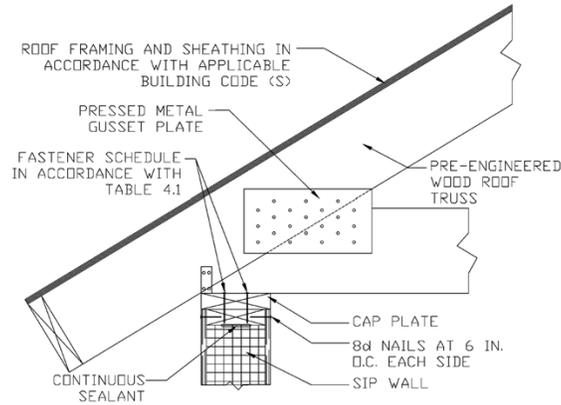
SIP Wall to Roof Connection (Structural Insulated Panel Association, 2007)
